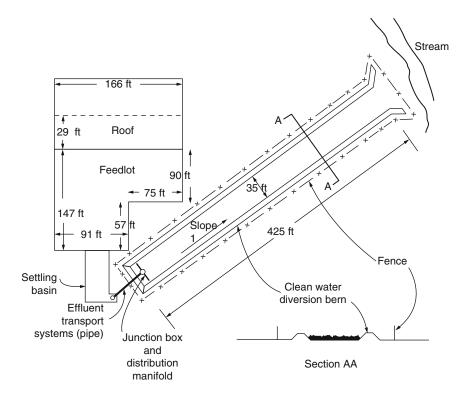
Plan for sample design example (76). 1 ft = 0.3048 m
